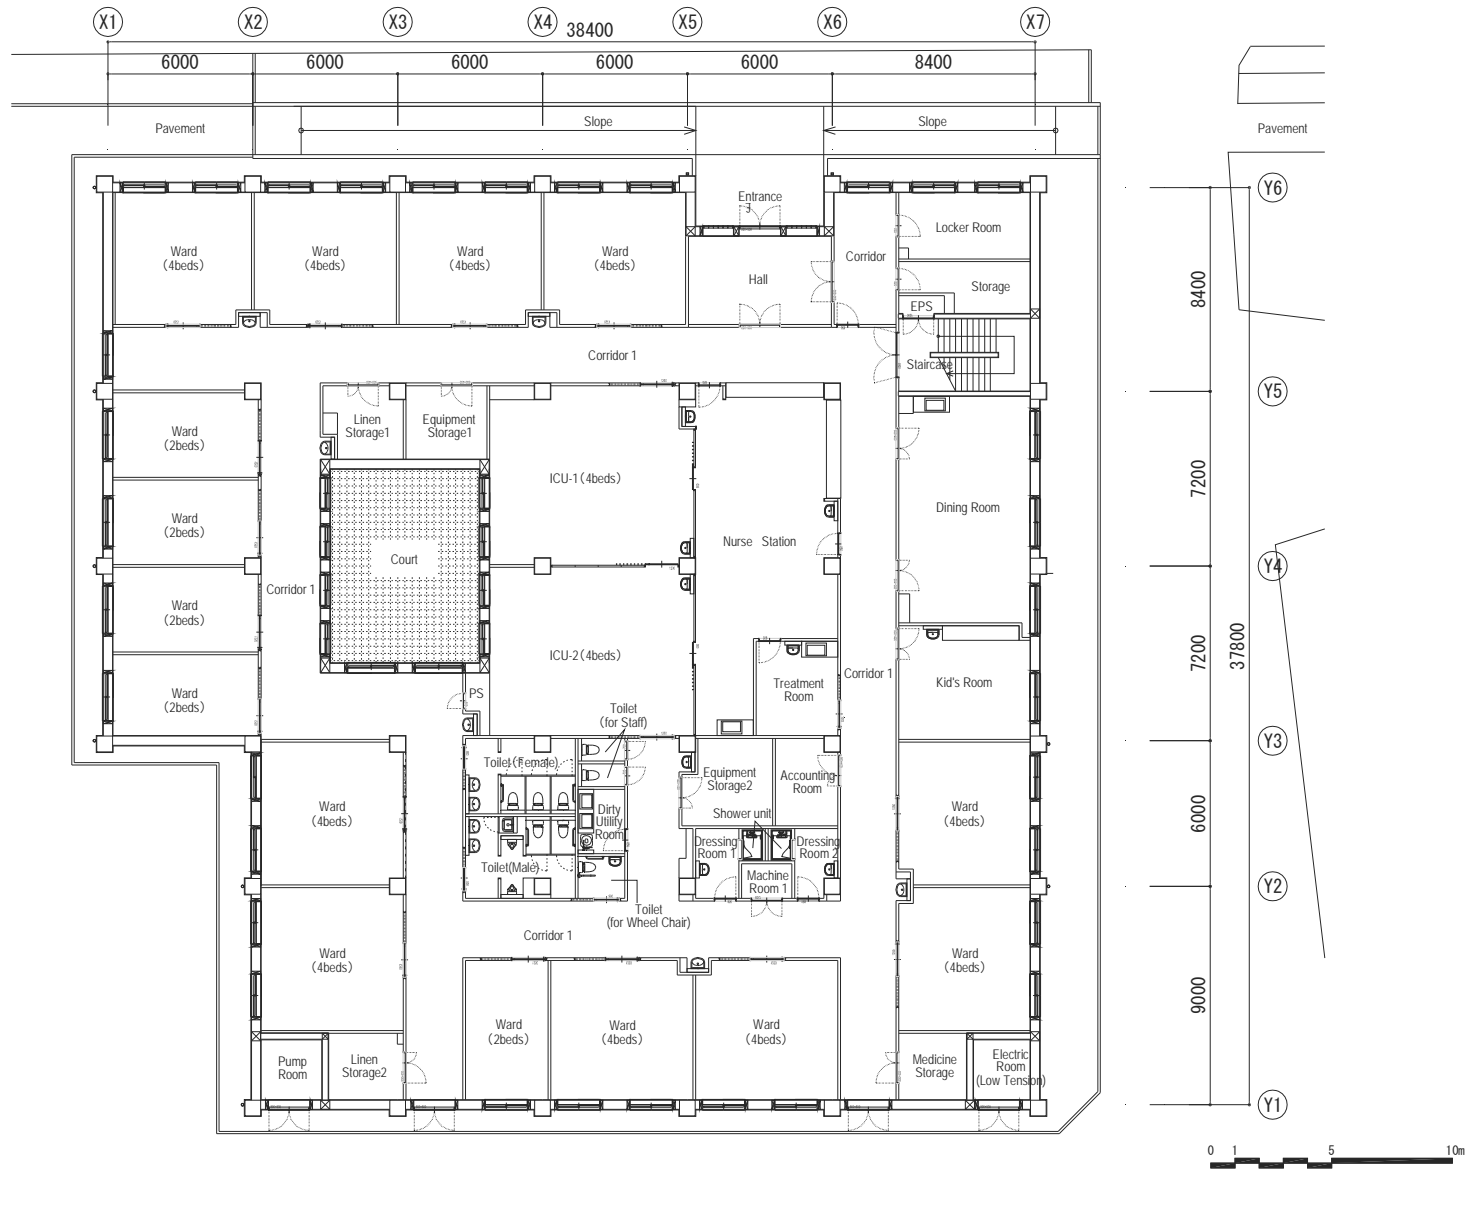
Pediatric Ward 2nd Floor/Roof Plan, 1/300
